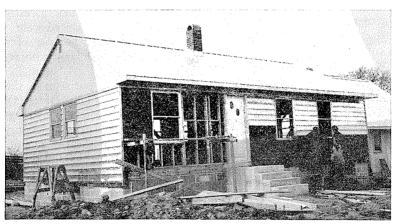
View of Exterior Wall during Construction Showing Framing Details and Aluminum Siding being Applied.
